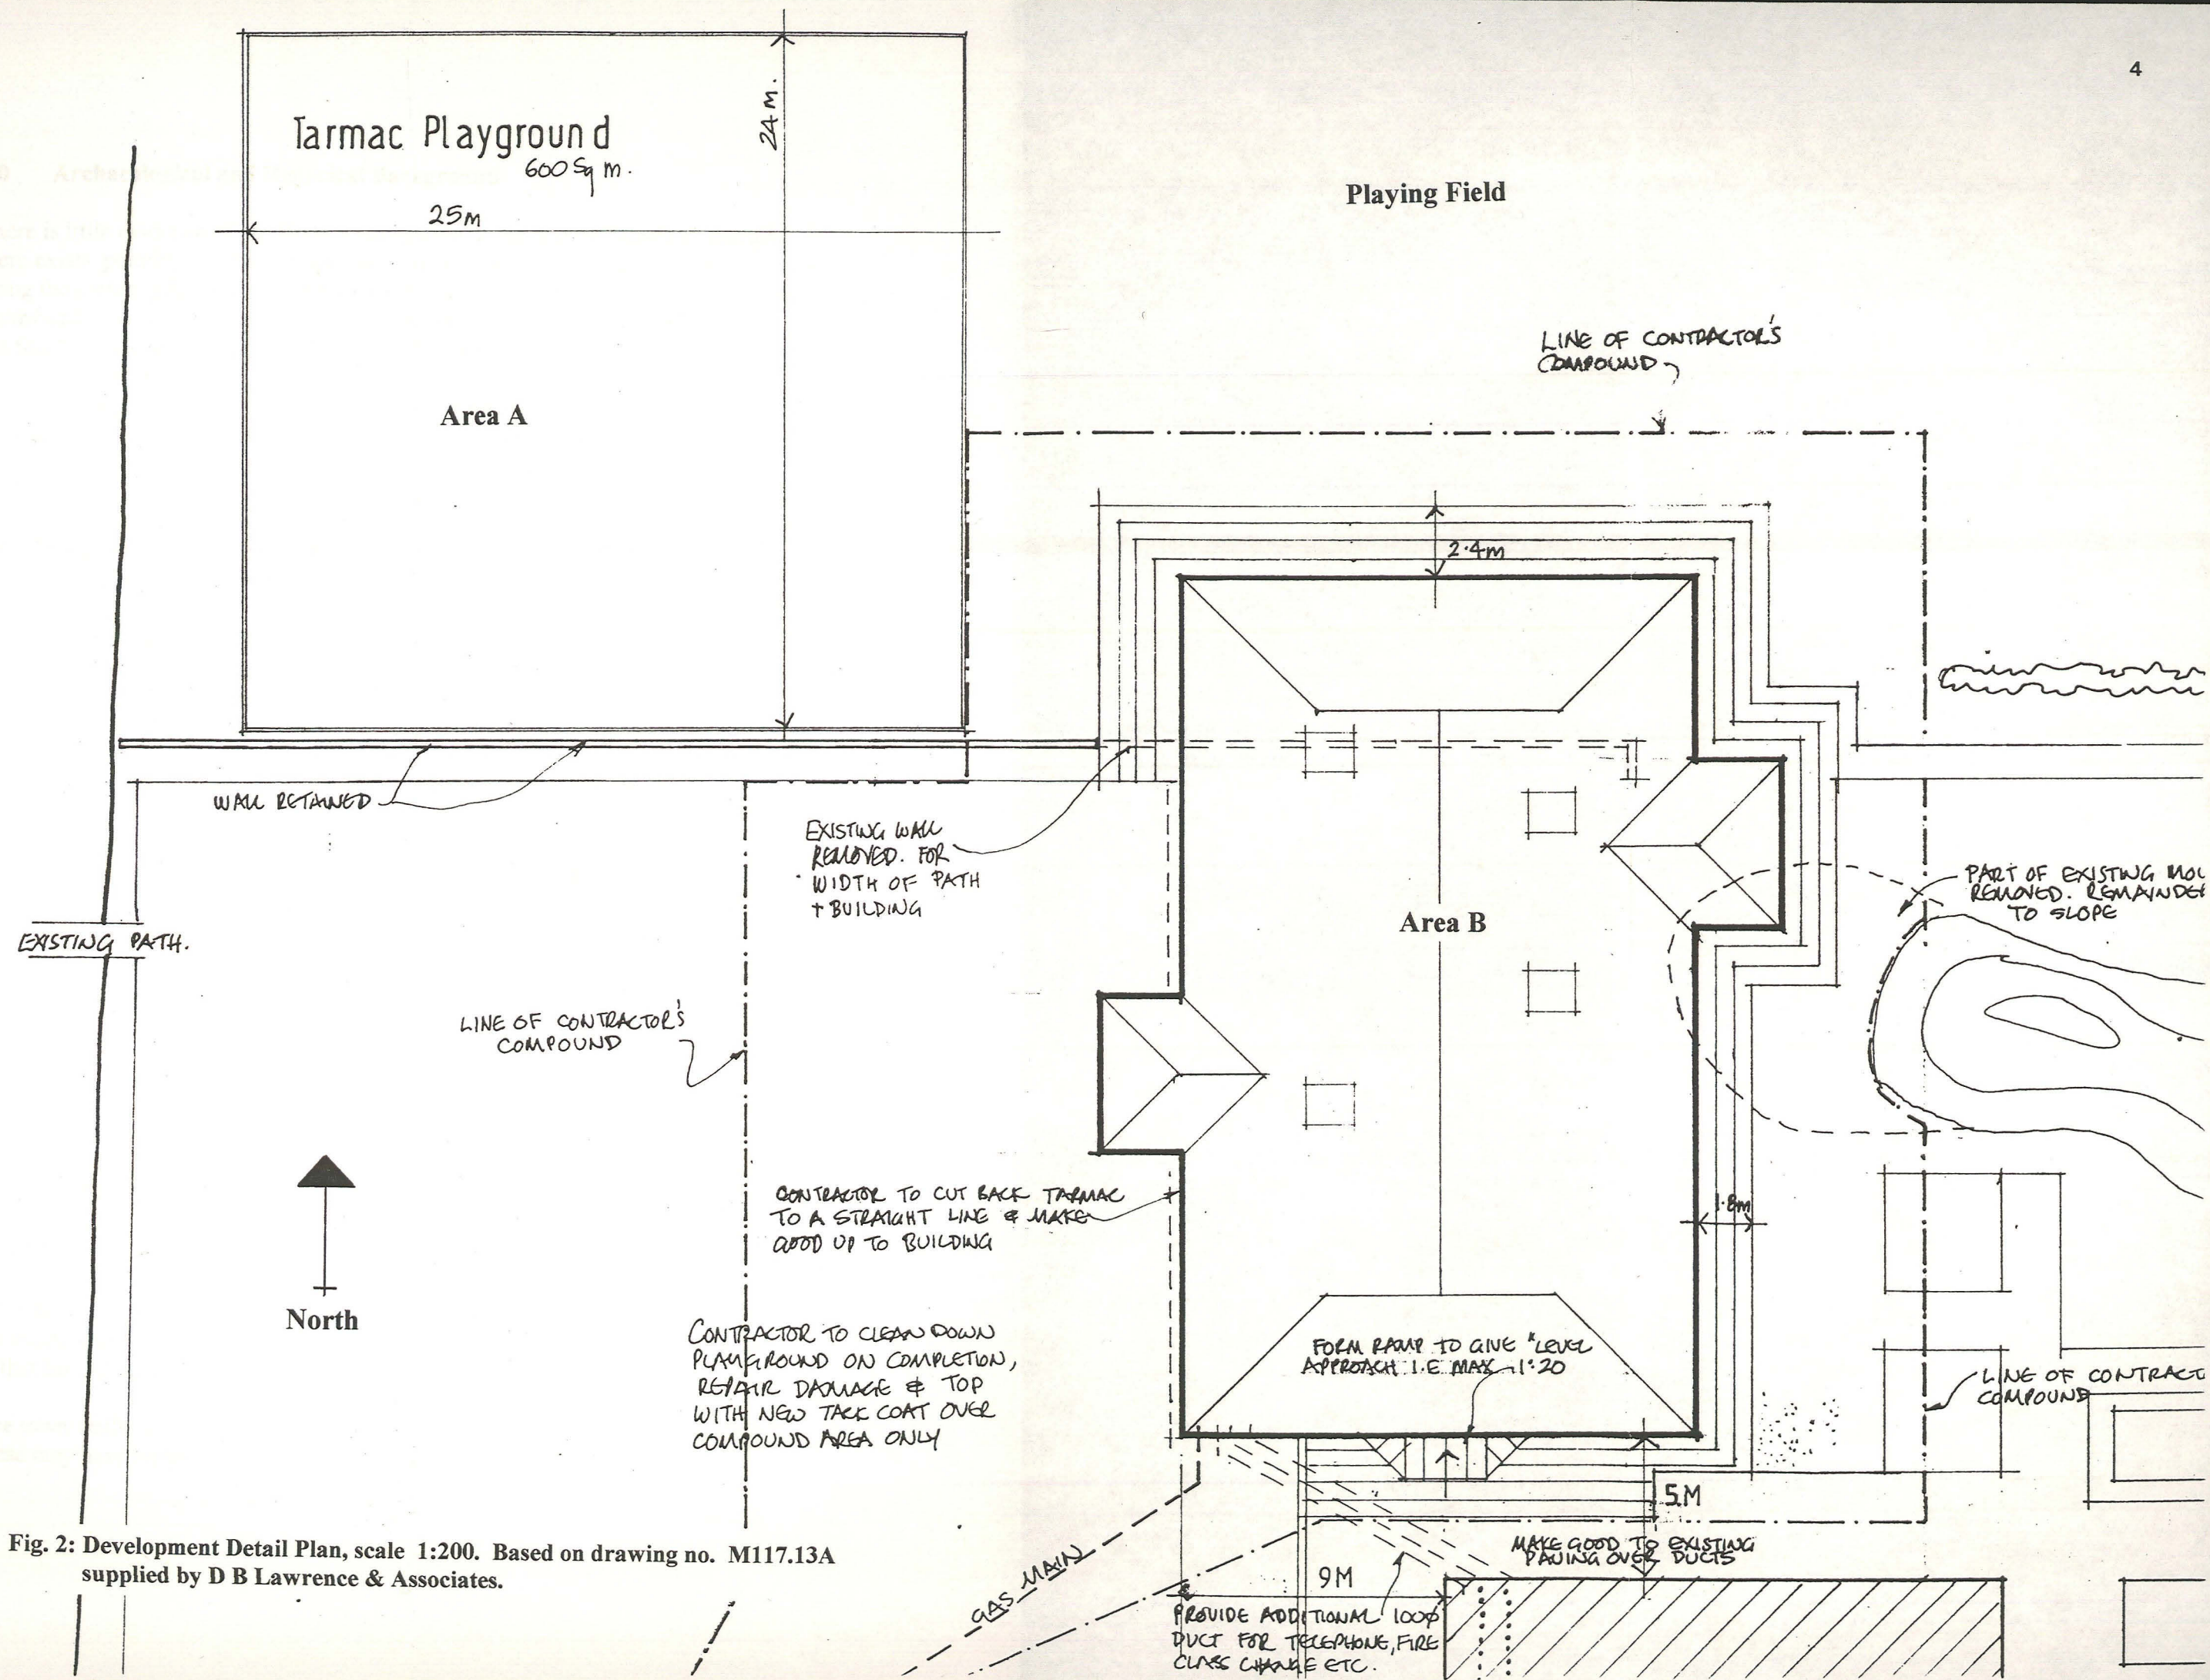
Development Detail Plan, scale 1:200. Based on drawing no. M117.13A supplied by D B Lawrence & Associates.
